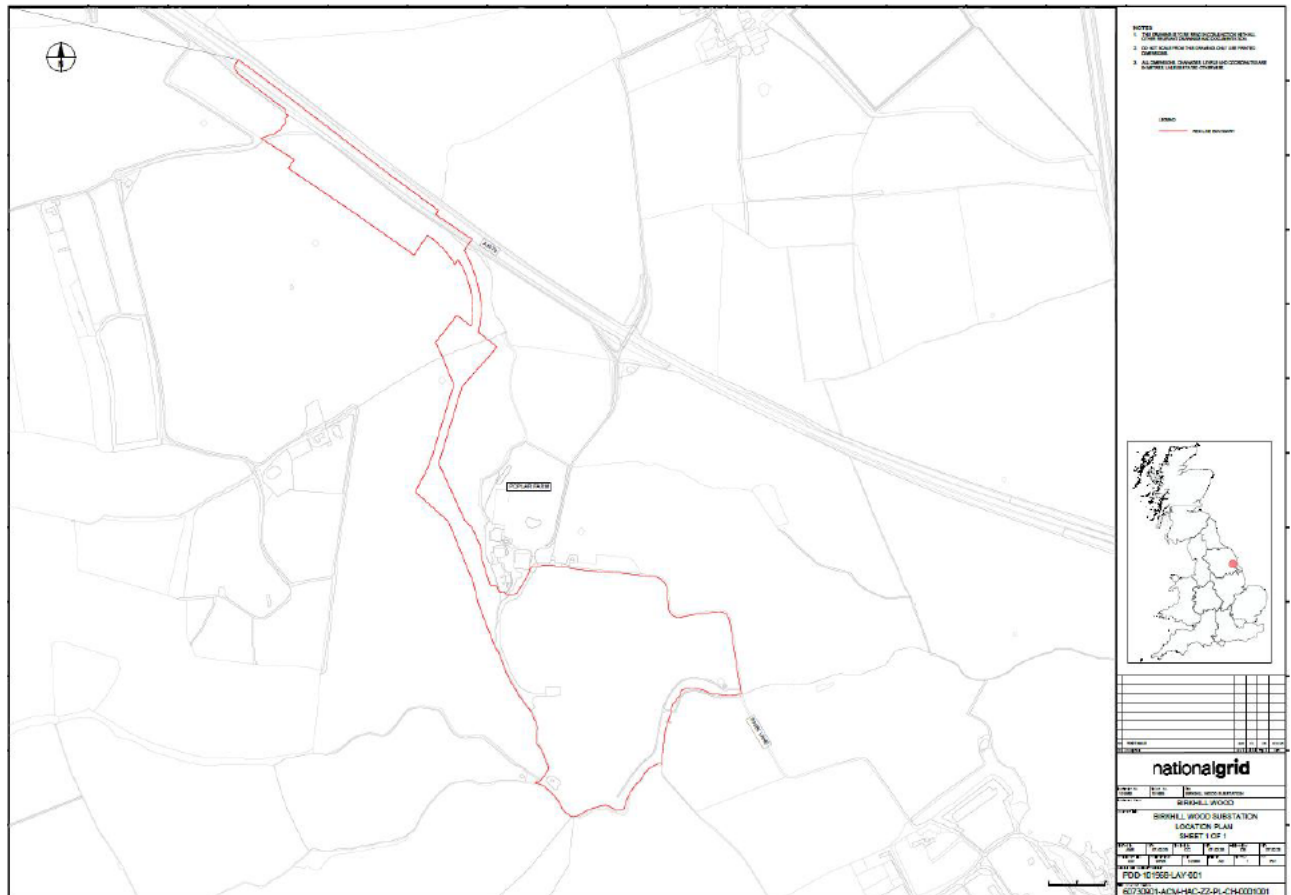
Location Plan of Birkhill Wood new 400kV Substation
